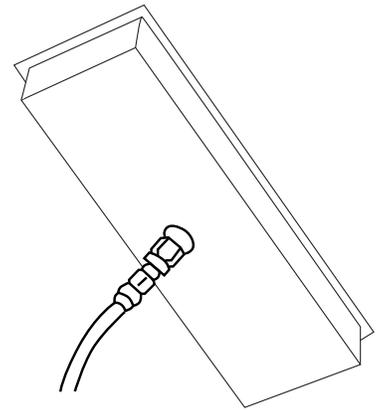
Attach 1/2" flex connector to 1/2" flared fitting on bottom of pan. Secure and gently lower pan into place.
